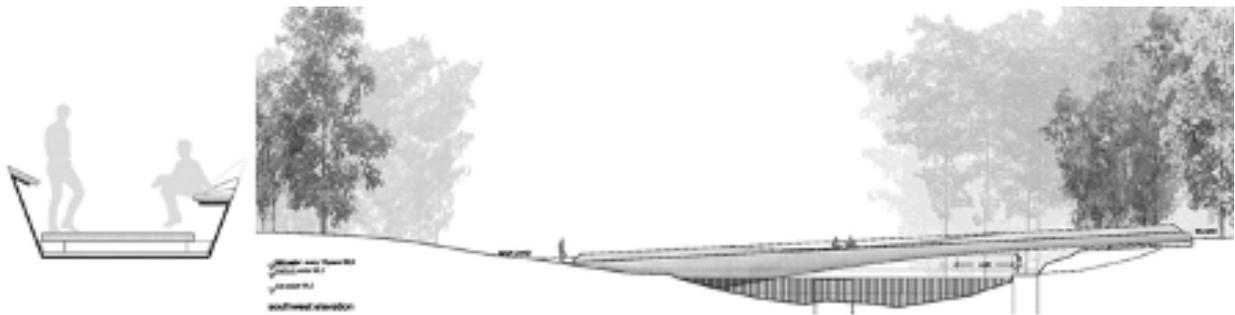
Gösta Bridge. Folded corten steel plates. Wood layer as railing and bench. Section and Elevation. Image courtesy of Mendoza Partida architectural studio
